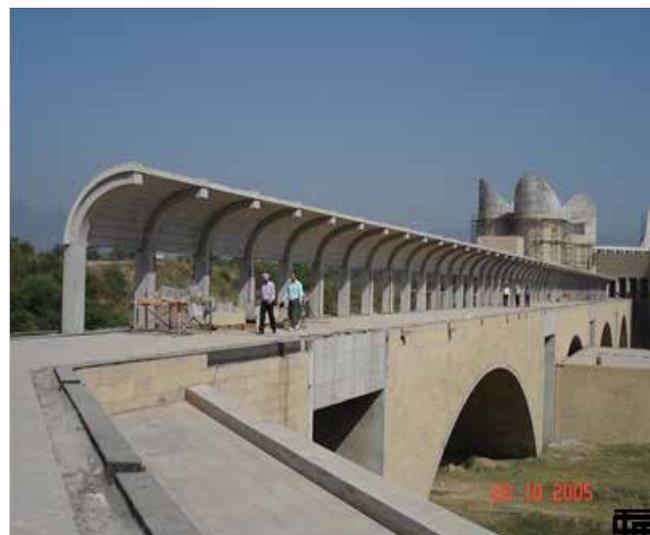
Precast Concrete Canopy Over Pedestrian Bridge
